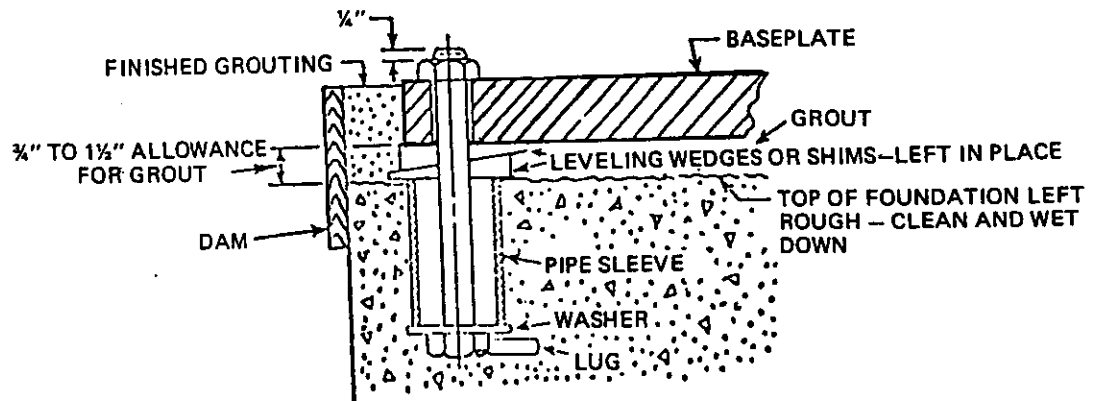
TYPICAL FOUNDATION BOLT DESIGN
